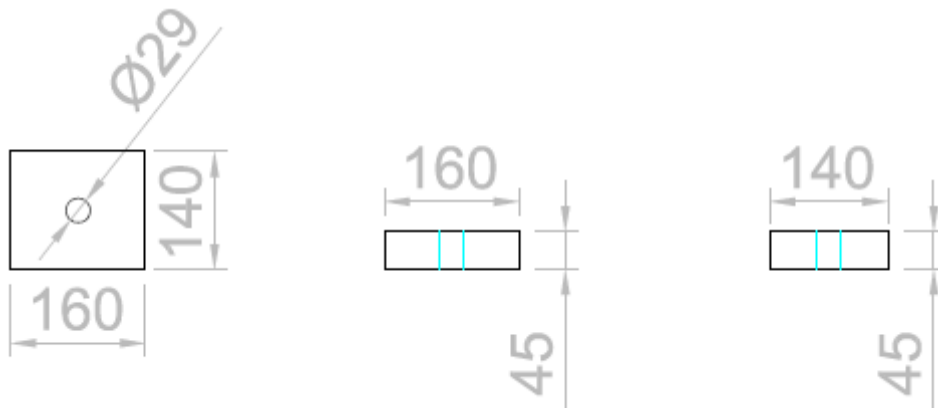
Dimensions of the plan view as well as the front and sides view of the hardwood plate used between timber C24 of the decks (in the largest and in the shortest beams) and the steel bars used to pre-stress.
